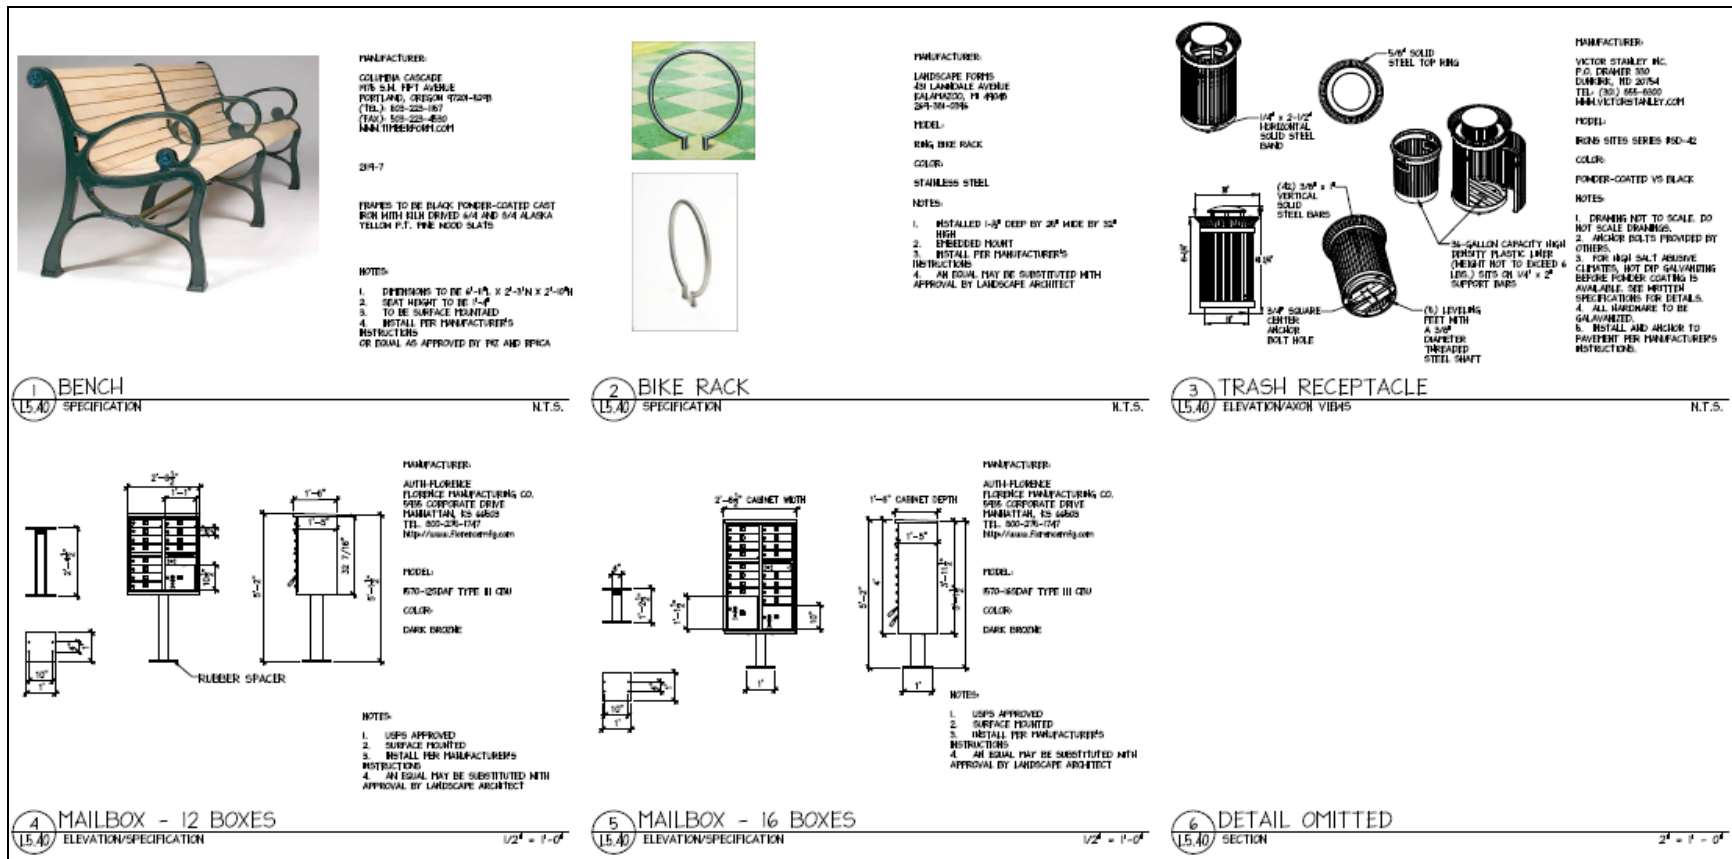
Proposed site plan elements: benches, bike racks, trash cans, and ganged mailbox units.
